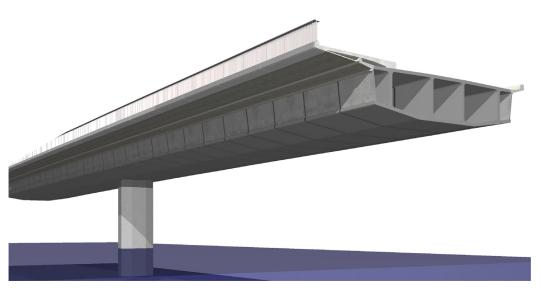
3D Sectional perspective showing extension of the bridge. Source: TZG Architects, June 2025.
